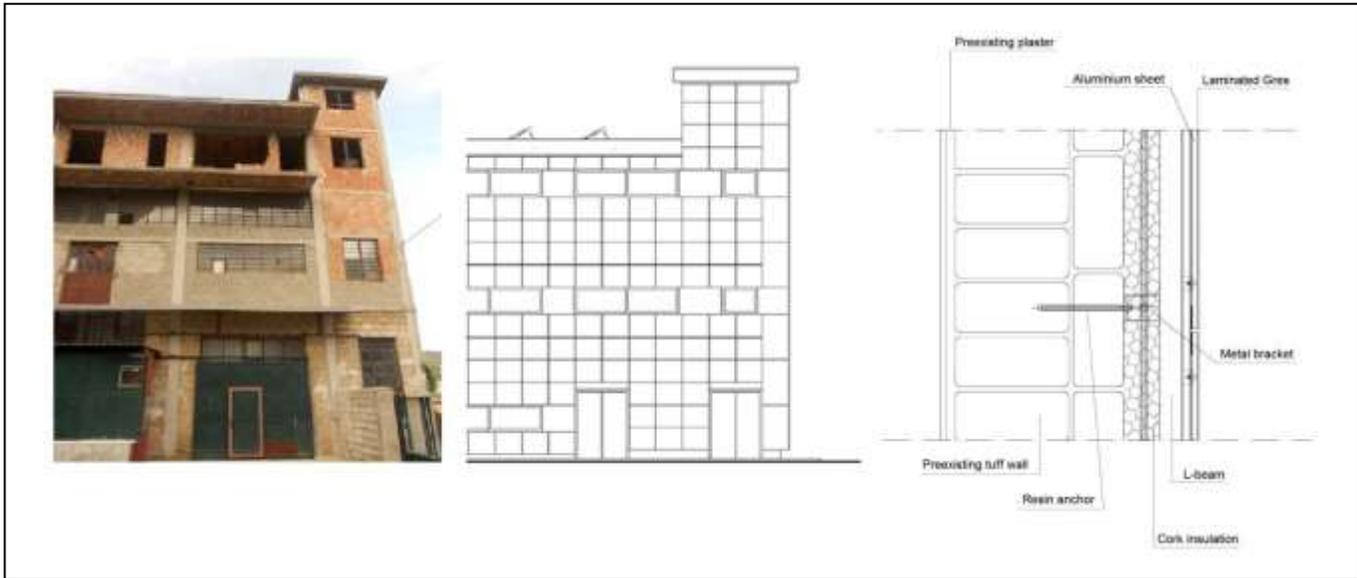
Left: part of the existing façade; centre: requalification of the façade with a ventilated wall; right: detail of the ventilated wall.
